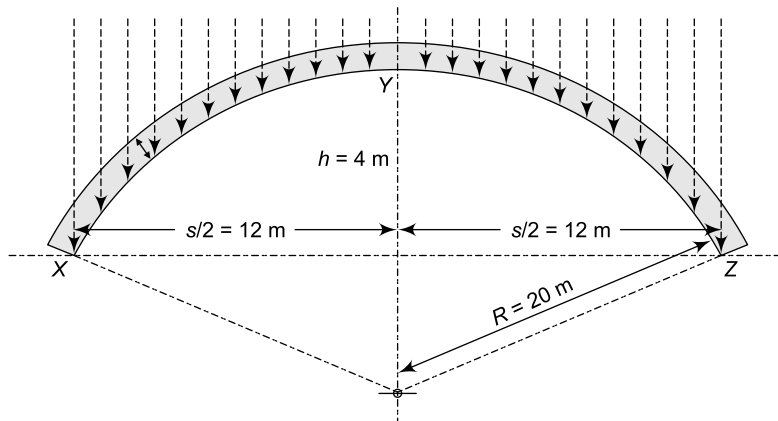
Circular Shell Roof-Derivation of Geometric Profile.
